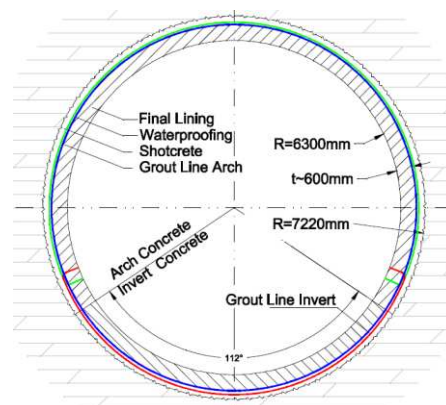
Cross section of the pre-stressed concrete lining of the Niagara facility [17, p. 7]
